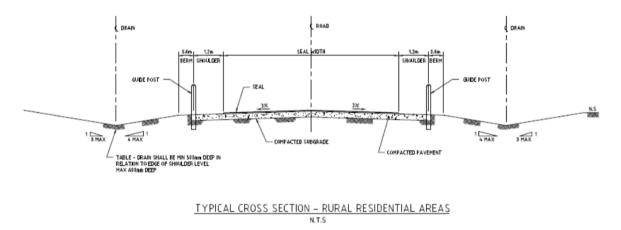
Indicative Road Cross Section for Internal Road Network (IPEWA)
